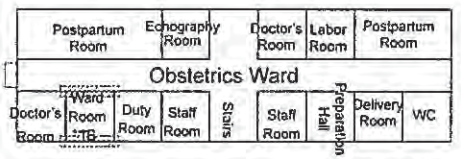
Post-Project Renovation and Relocation Plan for Existing Building B
